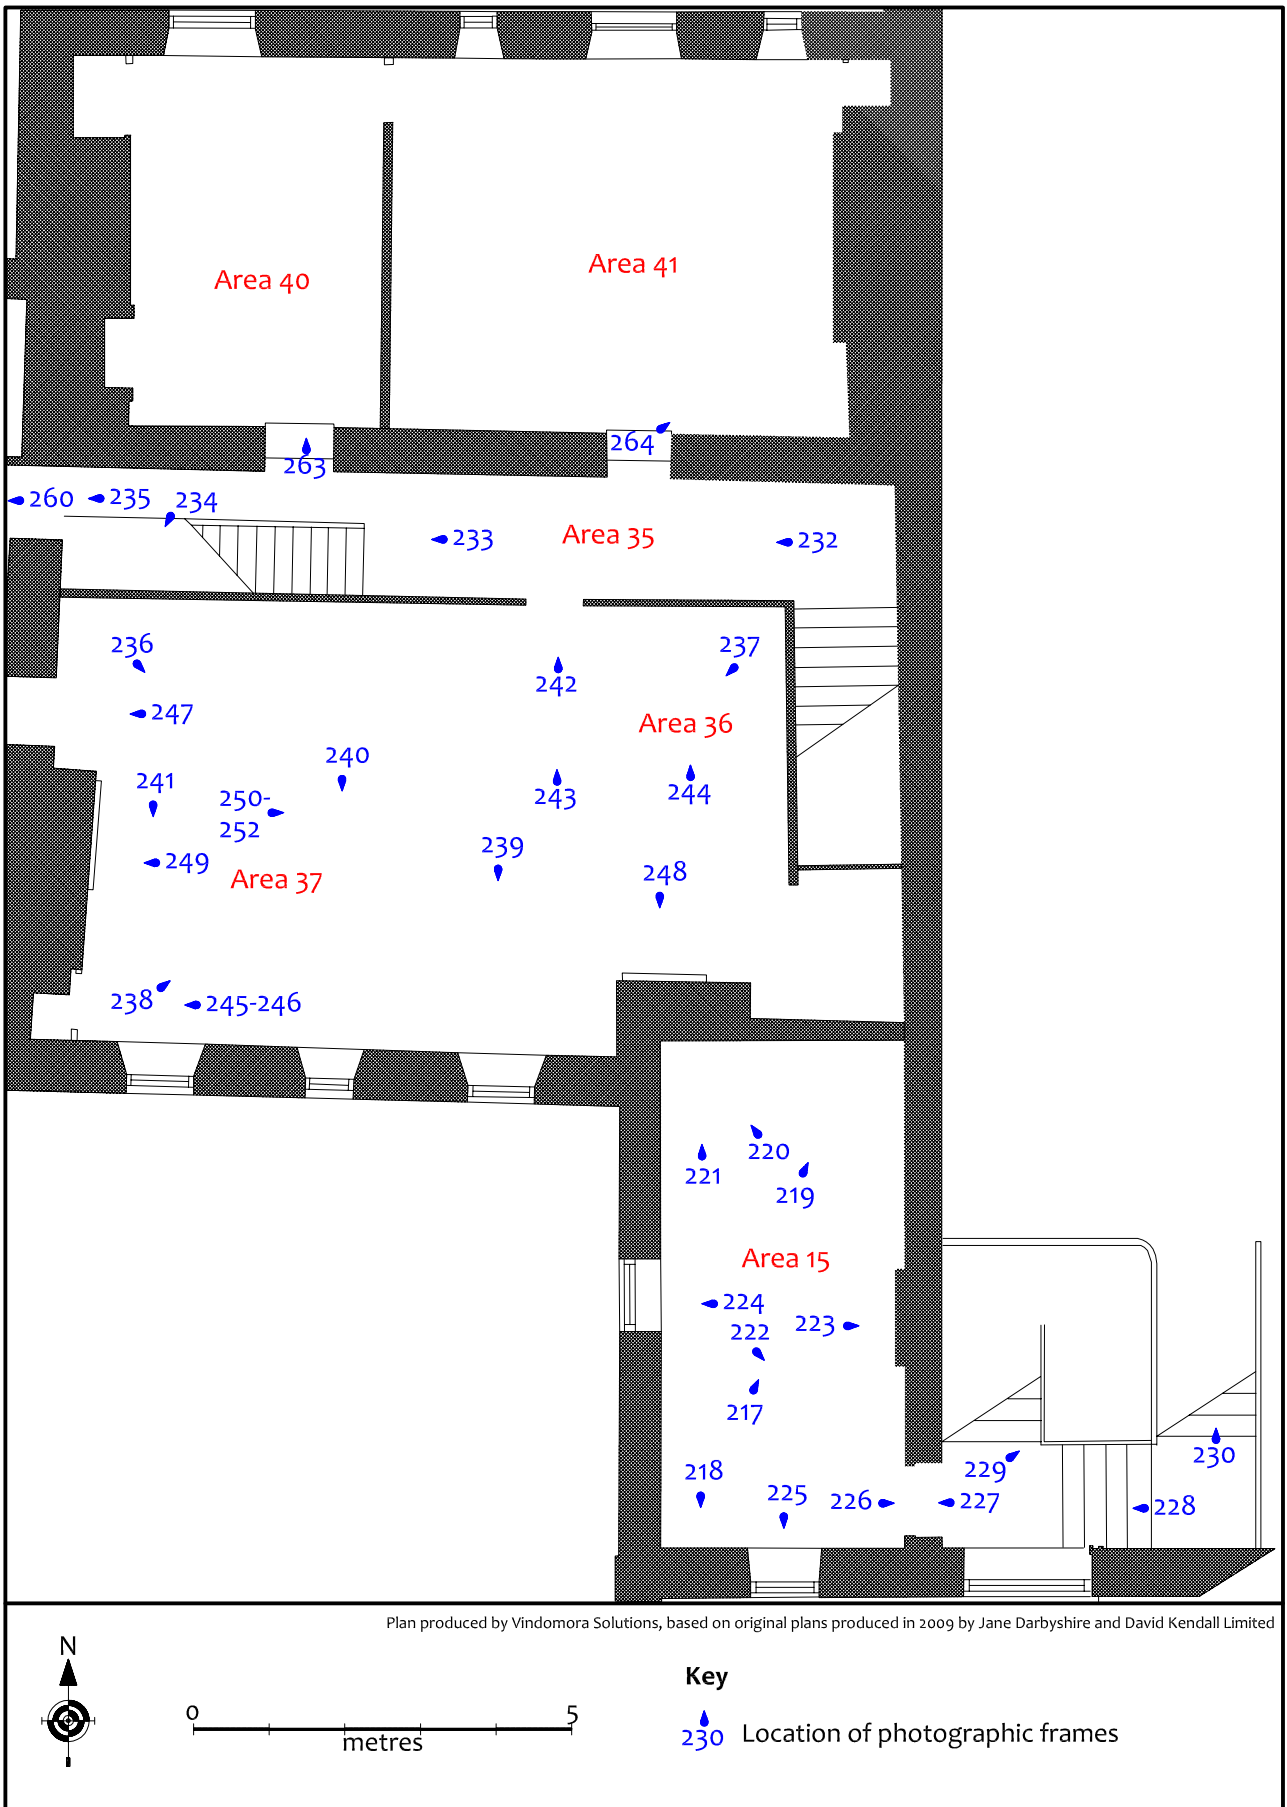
Mezzanine floor plan showing location of photographic frames. Areas 1, 15, 35-37, 40-41
